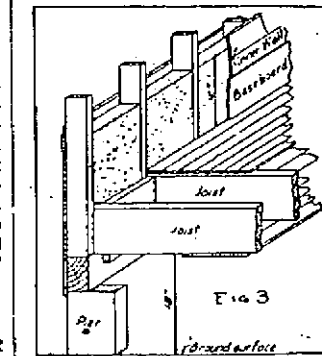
Buildings Supported on Piers Are Ratproofed by Raising Above Ground Level and Placing Concrete Between Walls Above Sills.
